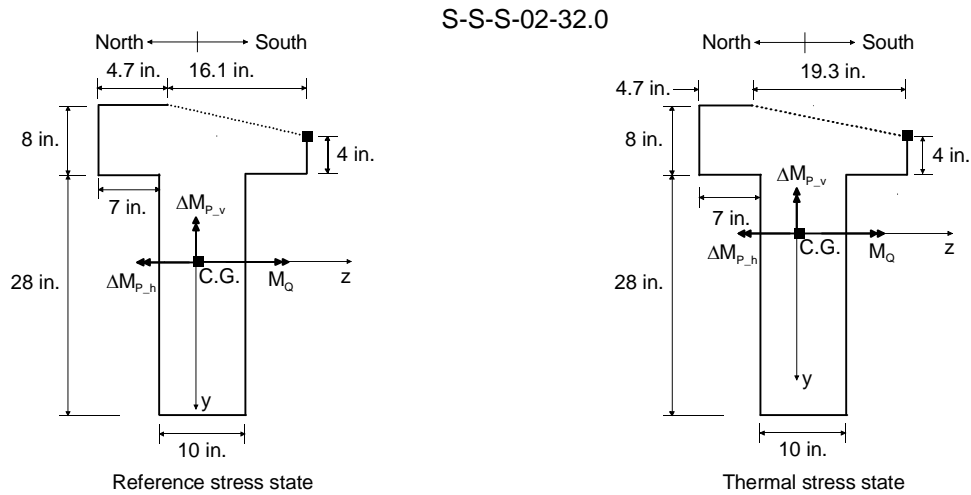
Contact areas at joint J2 at incipient joint opening on South side at elevation 32.0 in.
